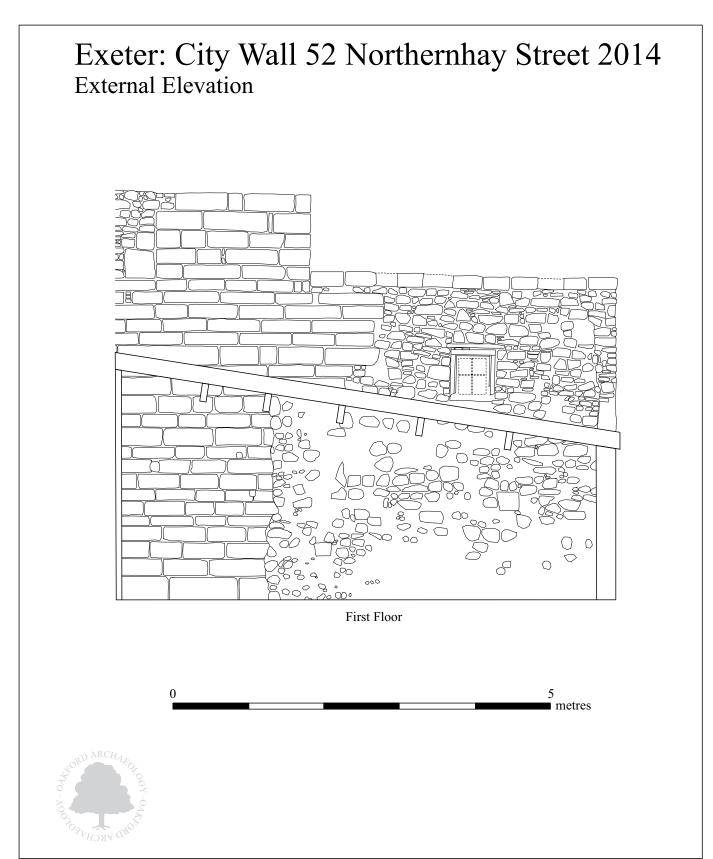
Detailed stone-for-stone recording of the wall to the south-east of No. 52 Northernhay Street.
